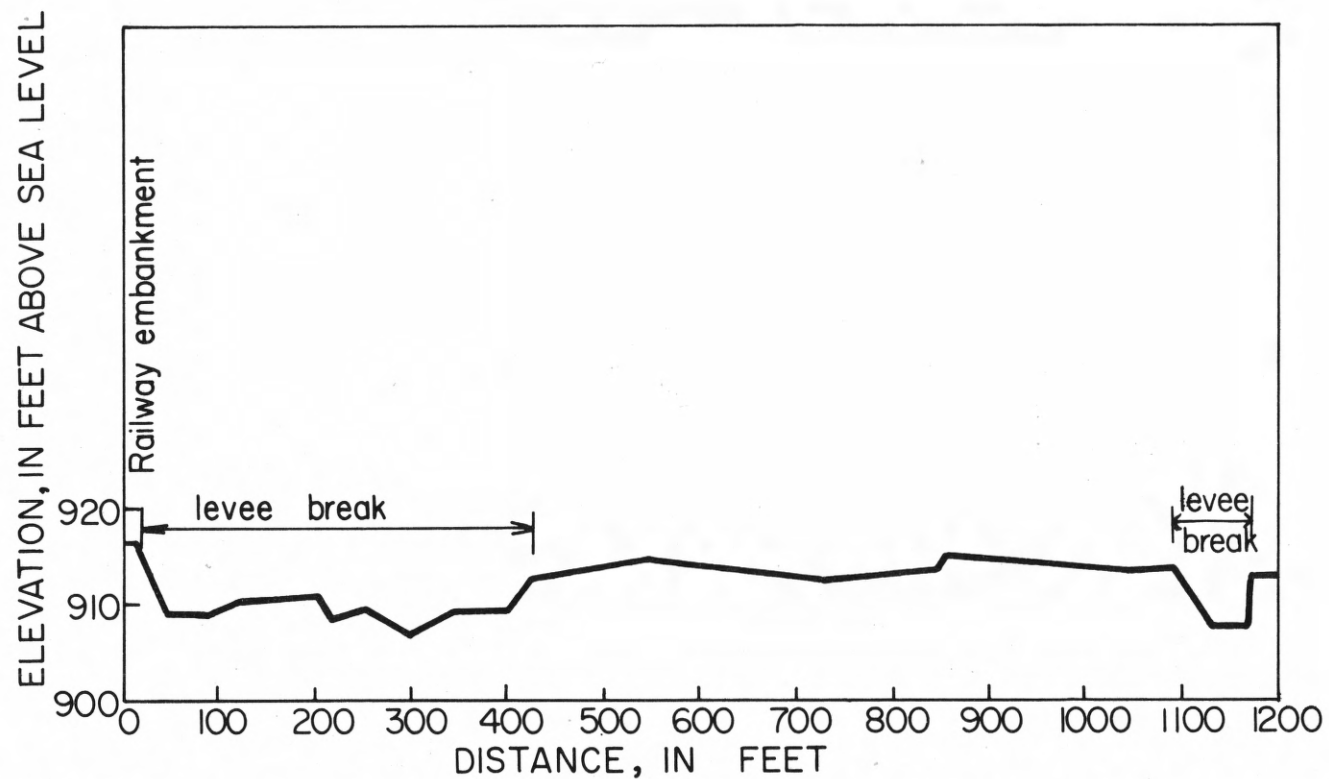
PROFILE OF MAD RIVER LEVEE ON LEFT BANK UPSTREAM FROM DT&I RAILWAY BRIDGE.
